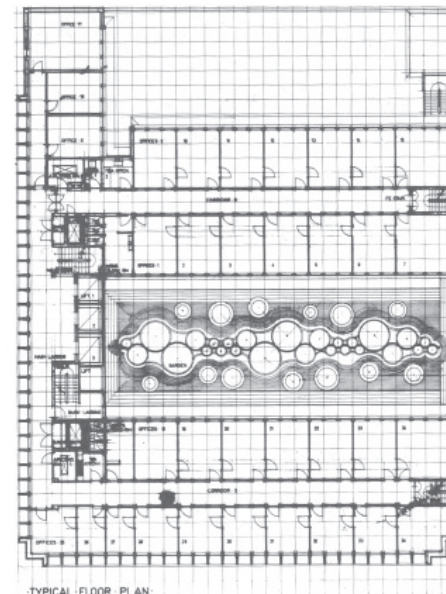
Floor Plan of the Nederlands Bank, Pretoria
